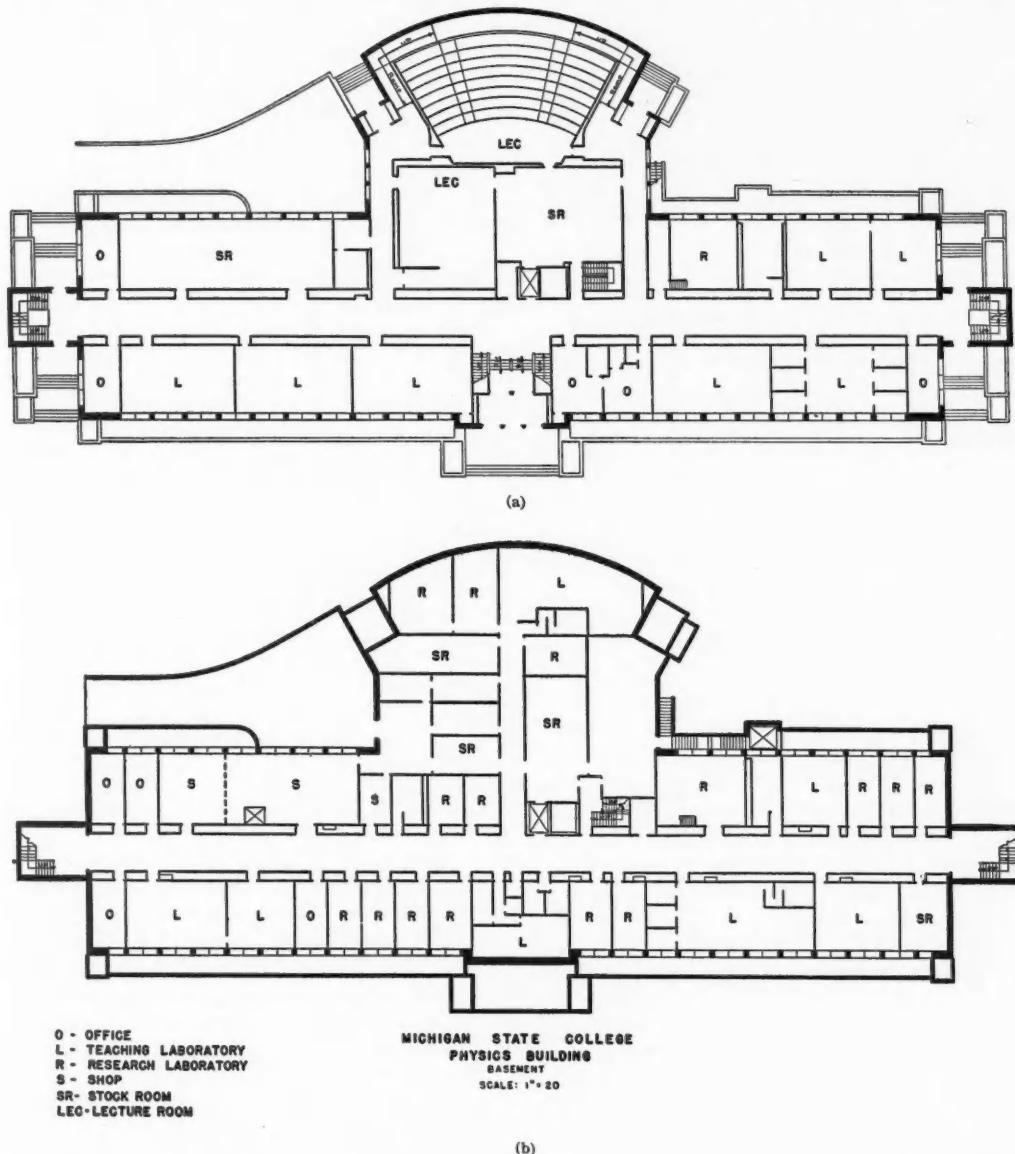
Floor plans of the Physics-Mathematics Building. (a) First-floor plan. (b) Basement-floor plan. The rooms are indicated as follows: LEC—lecture room; L—teaching laboratory; R—research laboratory; O—office; S—shop; and SR—storage room.
